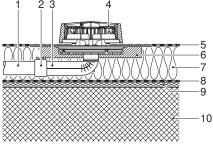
Installation in a solid roof insulated with horizontal outlet in the thermal insulation, roof foil and vapour barrier
